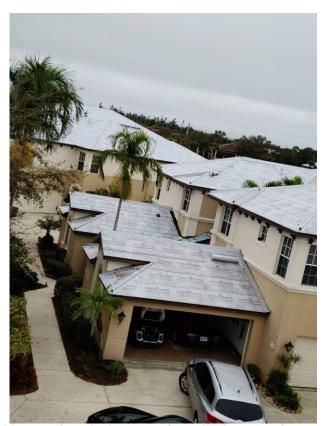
V-crimp metal valley flashing, and hip/ridge metal channel installations were in progress on building 21700.
